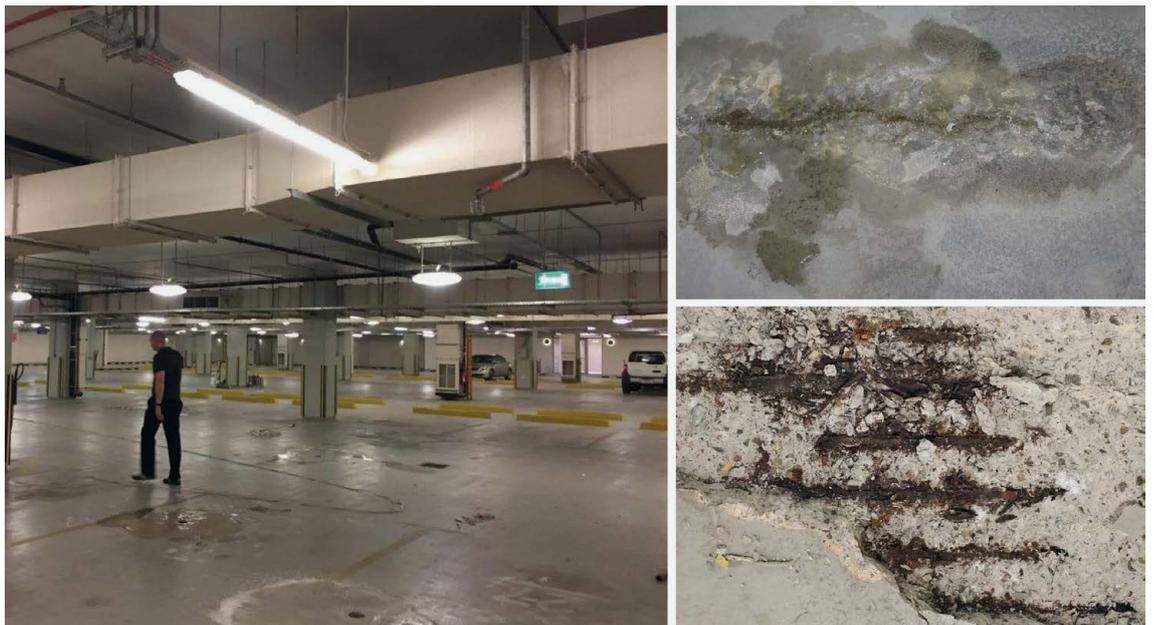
Floor slab of an underground car park in the United Arab Emirates with non self-healing water-bearing cracks and heavily corroded reinforcement
